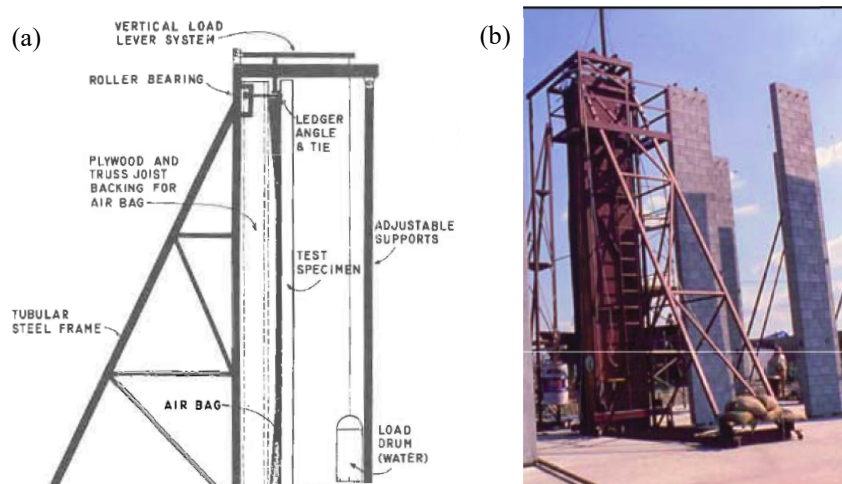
Slender walls test program (a) Side elevation of the test setup (b) Loading frame next to ready-to-test walls (ACI-SEASC, 1982).
